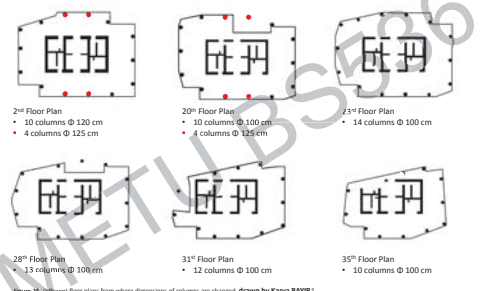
Different floor plans from where dimensions of columns are changed, drawn by Karya Bayir⁷
